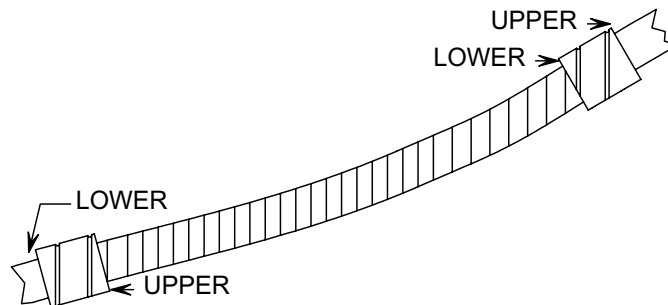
Cable Section Showing Upper and Lower Cable Bands On a Suspension Bridge
